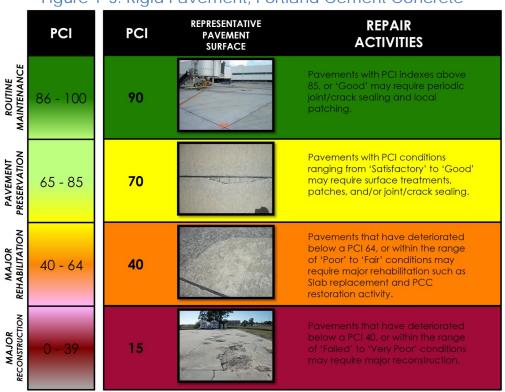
Rigid Pavement, Portland Cement Concrete
